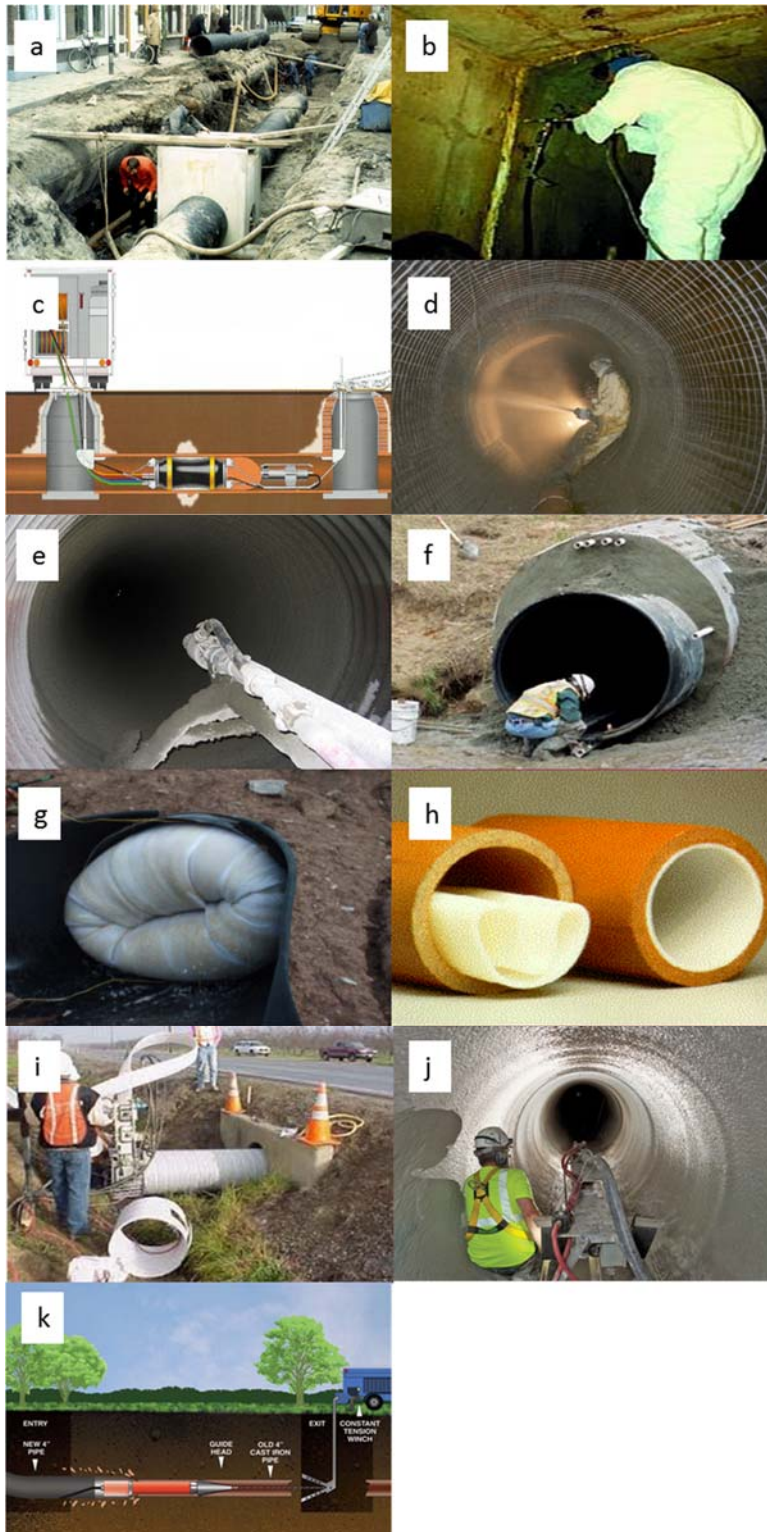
Illustrations of culvert renewal methods: (a) Open-cut, (b) Internal grouting, (c) Robotic grouting, (d) Internal shotcreting, (e) Robotic shotcreting, (f) Slip-lining, (g) CIPP, (h) Fold and form lining, (i) Spiral wound lining, (j) Centrifugally-cast
